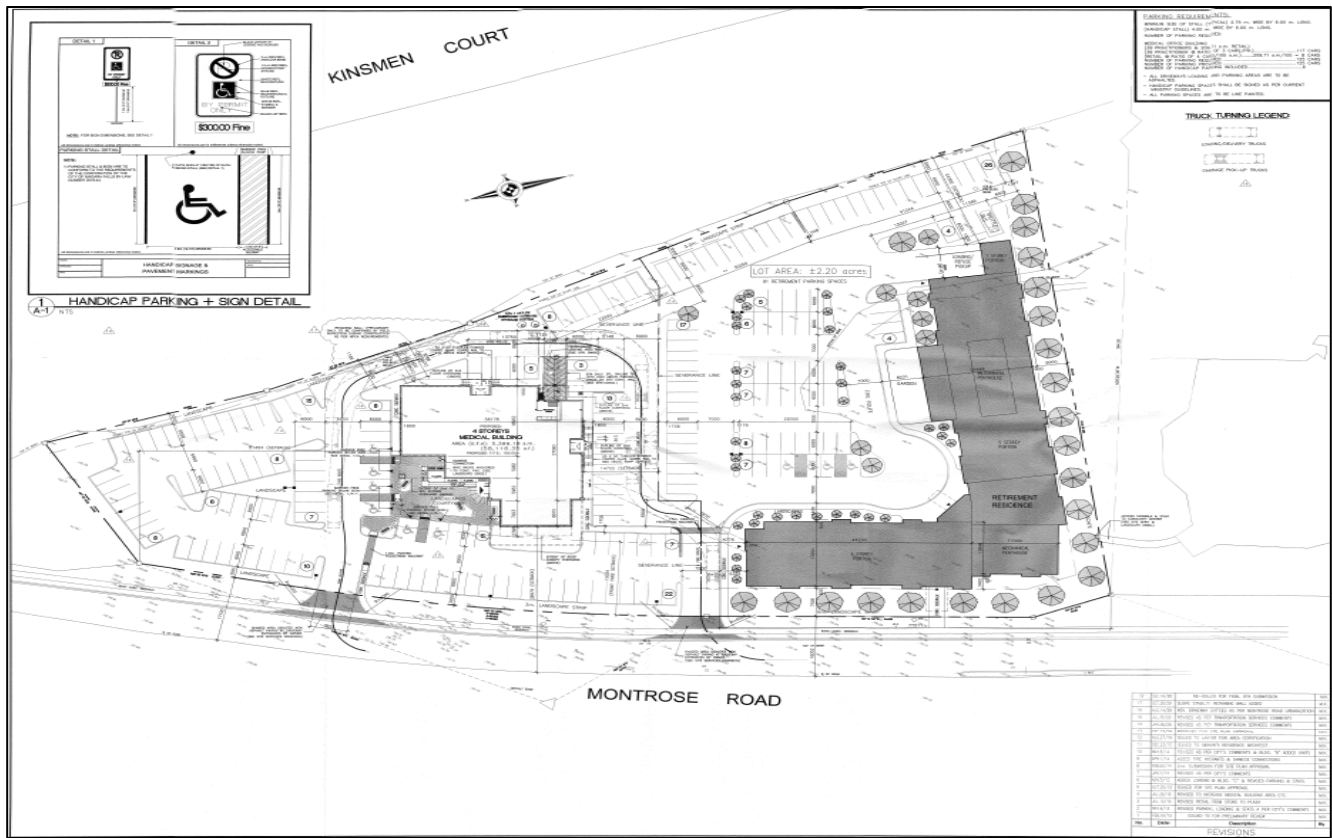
Proposed Site Plan of Medical Office Building and Retirement Residence Apartment Building, Prepared by Y.T Architectural Services Inc.
